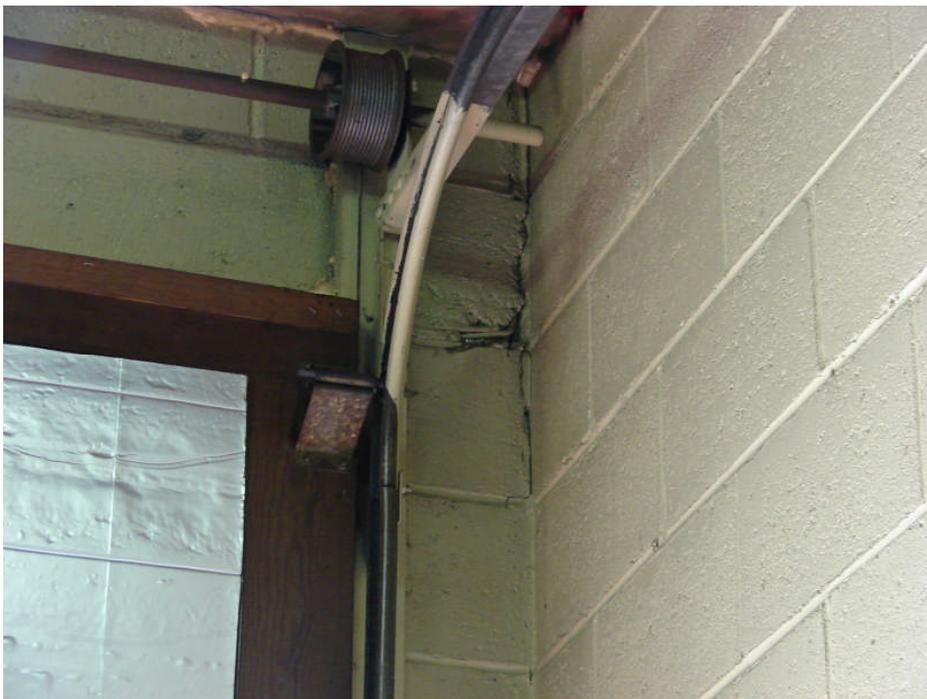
Garage Building east wall – concrete block wall step cracking at north end, typical.
